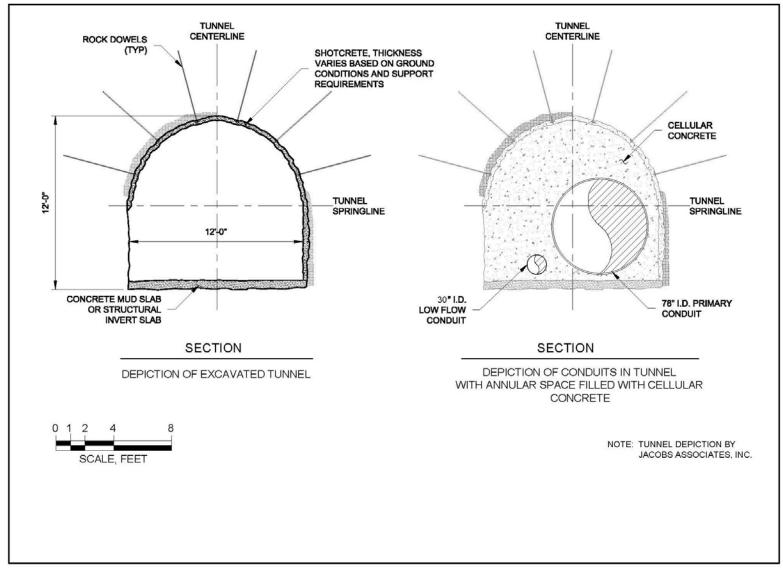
Schematic Depiction of Tunnel Cross-Section
